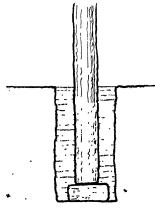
Pole Sunk in Earth with Brick Footing.
